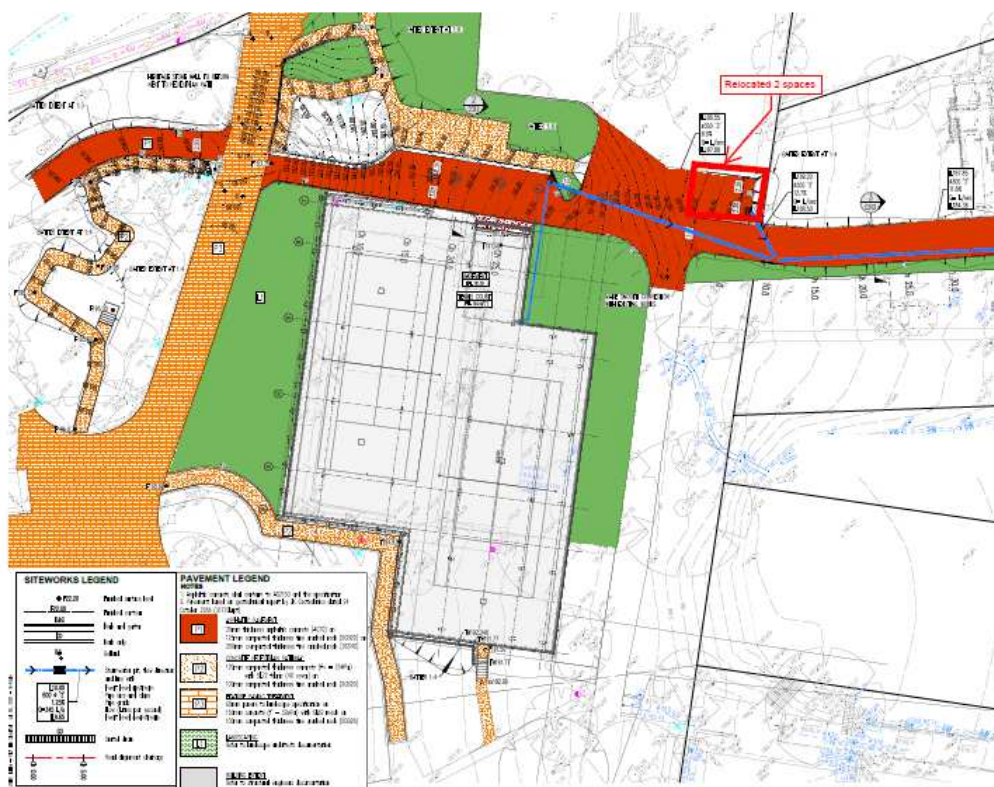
Amended Civil Drawing – location of the two (2) relocated parking spaces
